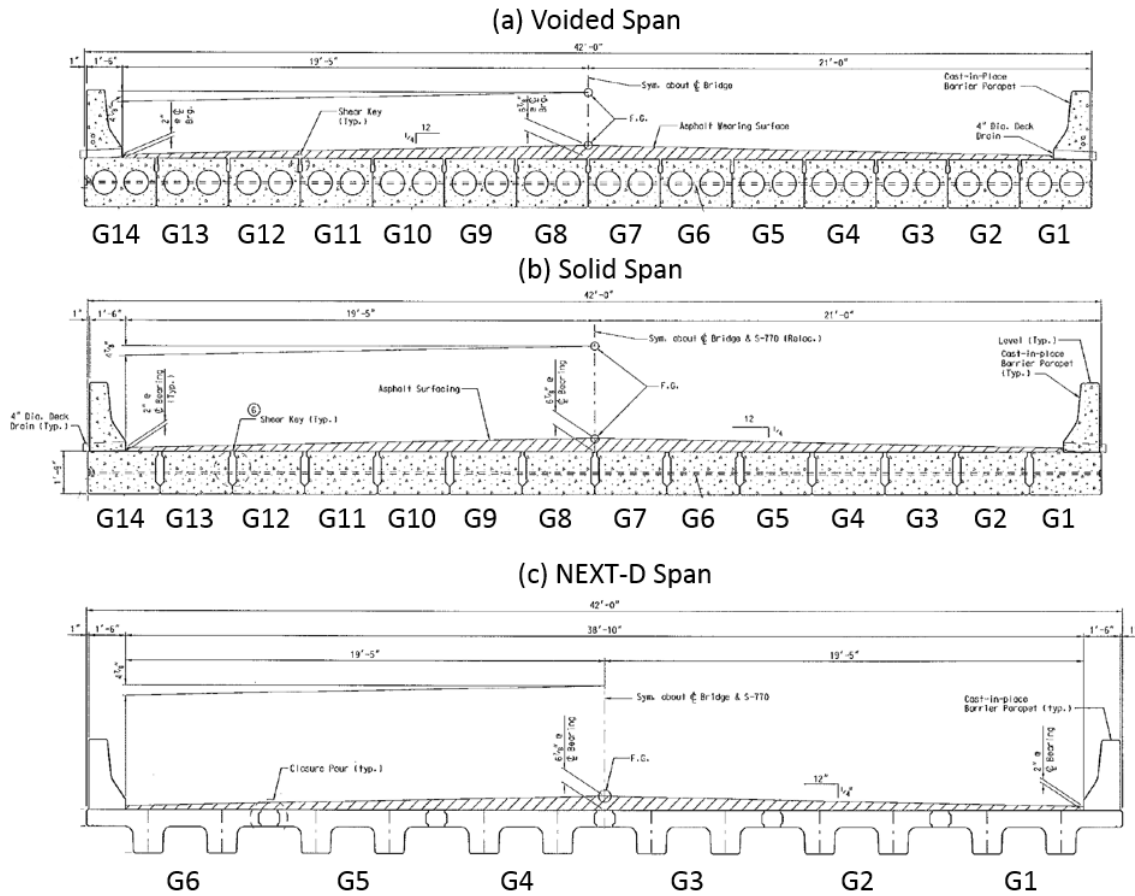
Cross-sections of the voided, solid, and NEXT-D spans looking north
